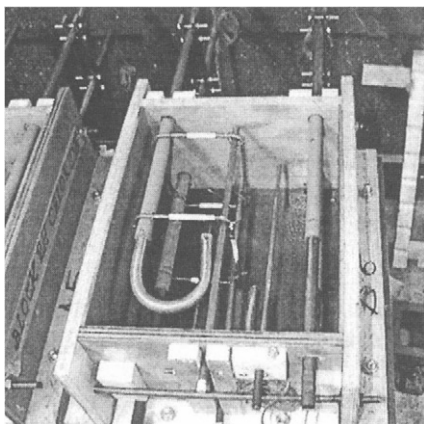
Hooked bond bar corrosion specimen, before casting
